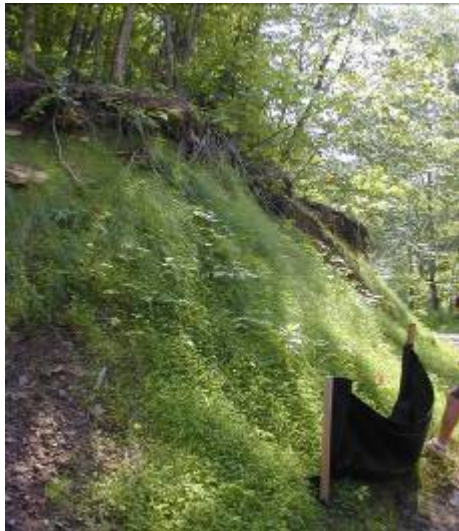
Silt fence trap on log road embankment planted with native seed mixture.
